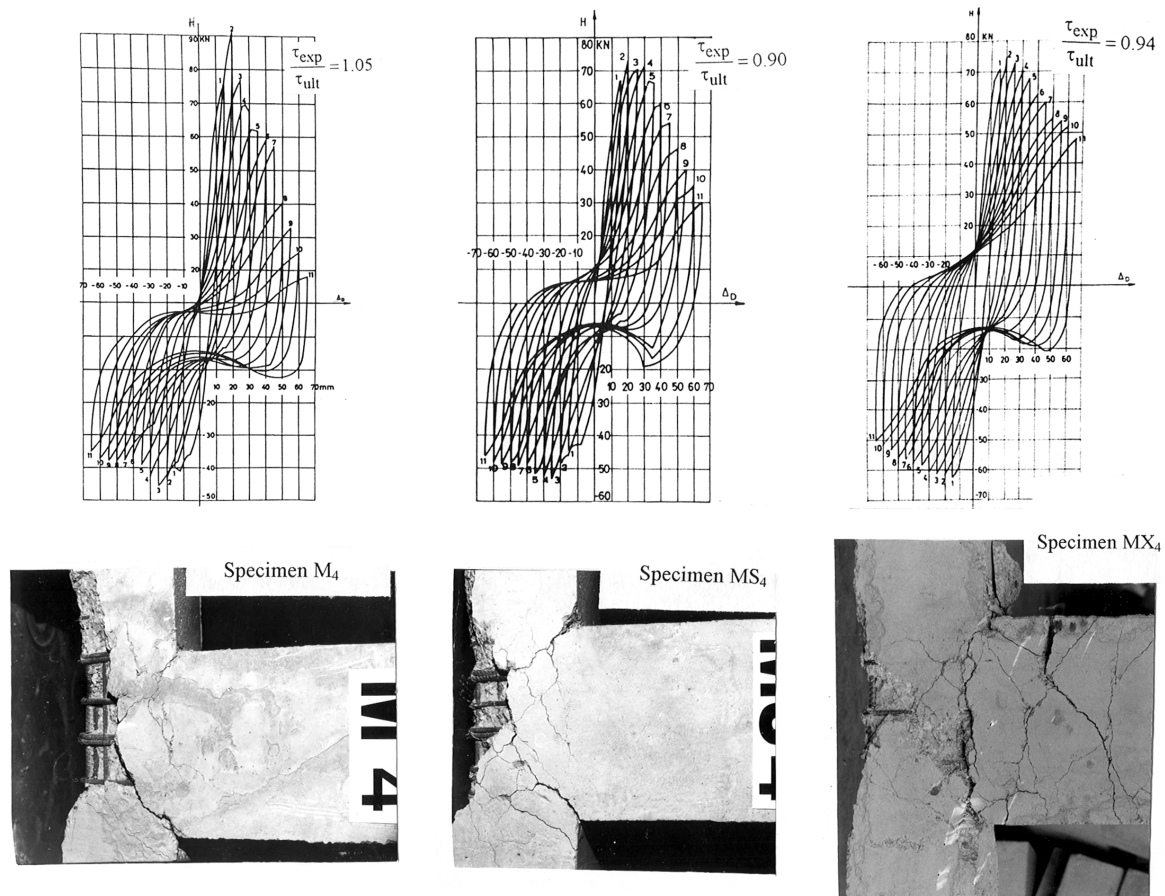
Hysteresis loops and cracking pattern for specimens M_4 , MS_4 and MX_4
